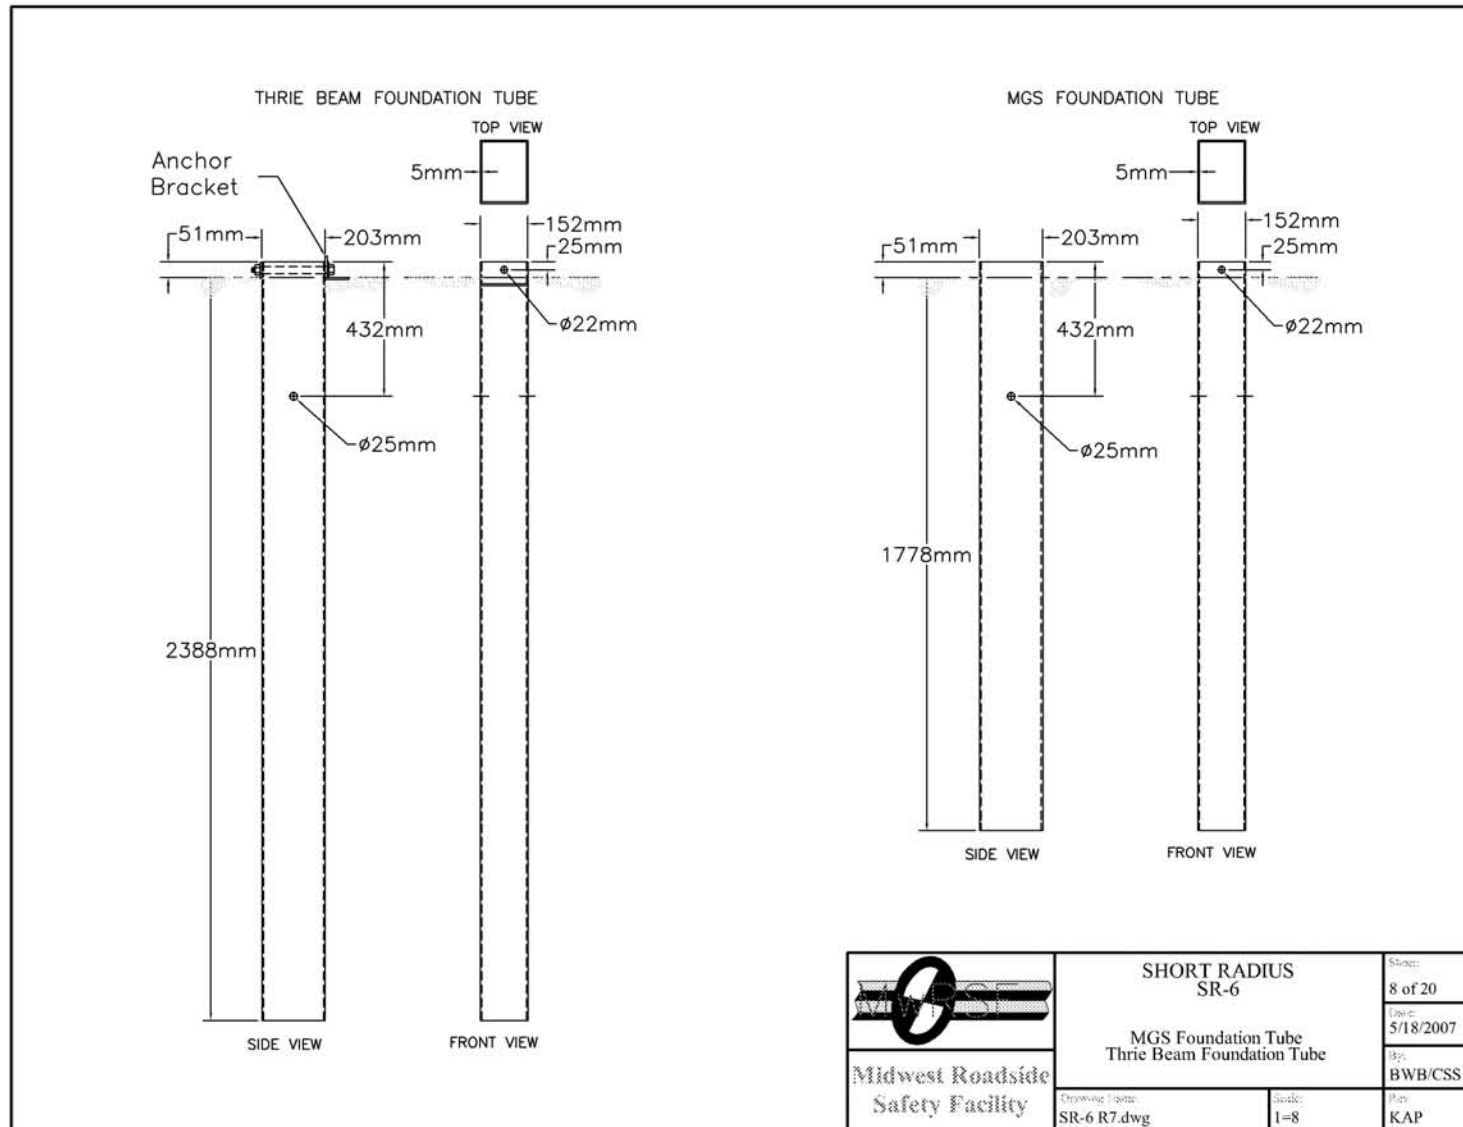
MGS and Thrie Beam Foundation Tubes, Test SR-6
